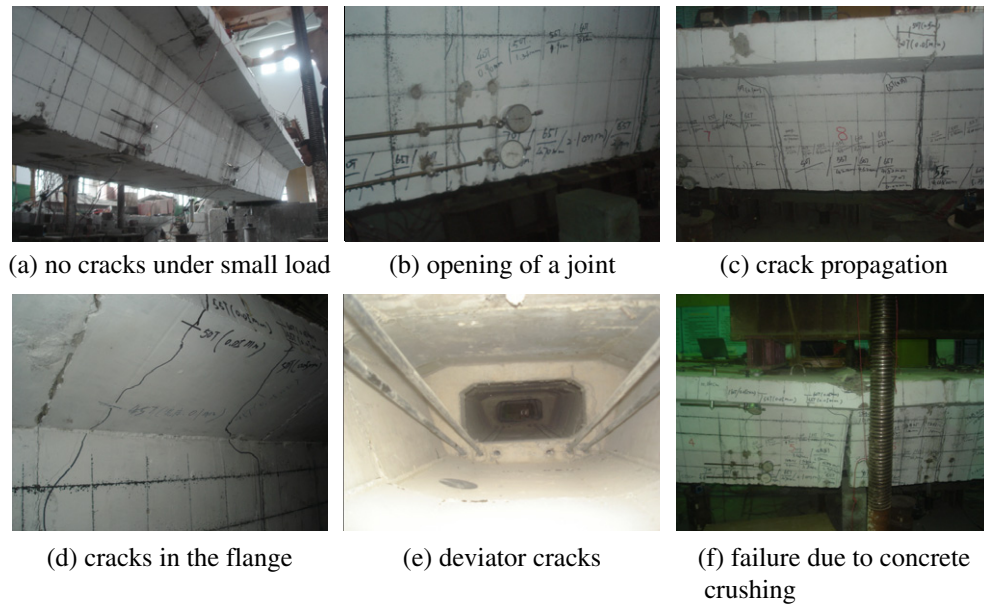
SPCB2-4-4 box beam failure sequence and failure mode.
